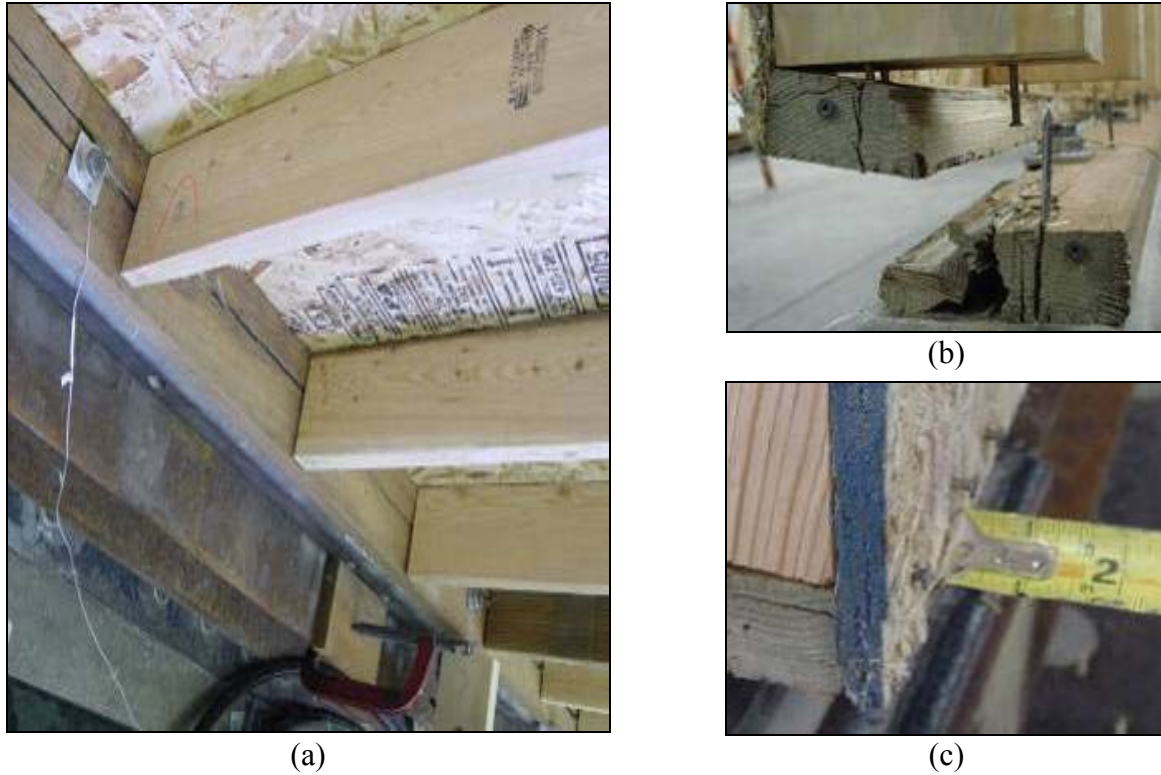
WOOD4 failures: (a) Typical sill splitting full length (Test WOOD4-1), (b) Sill end split (Test WOOD4-2), and (c) Sheathing nail pull-out at wall end (Test WOOD4-1)
